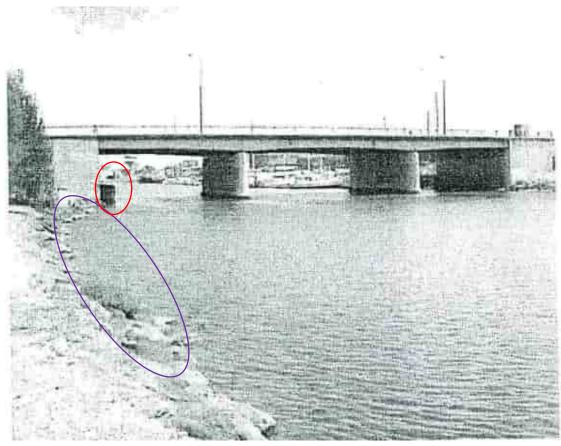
Photograph taken from the eastern bank looking downstream at the Footscray Road bridge. Eastern bluestone abutment circled in red and receded bank in purple (photograph taken pre-2003).
